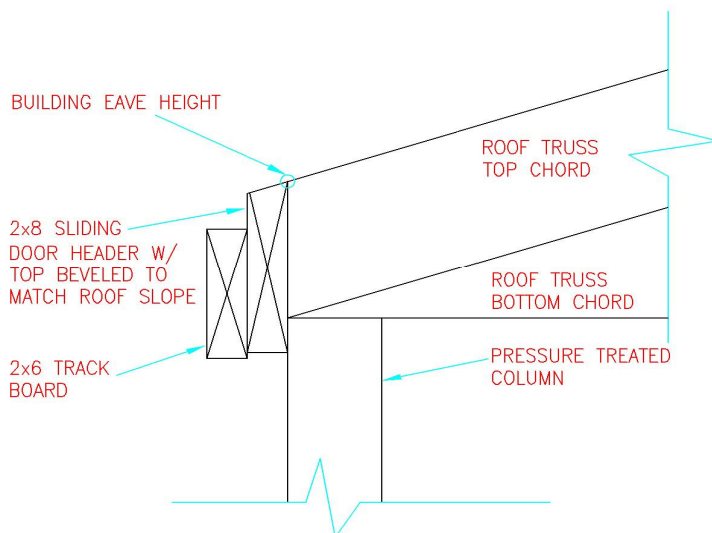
Bevel Cut Sidewall Sliding Door Header
